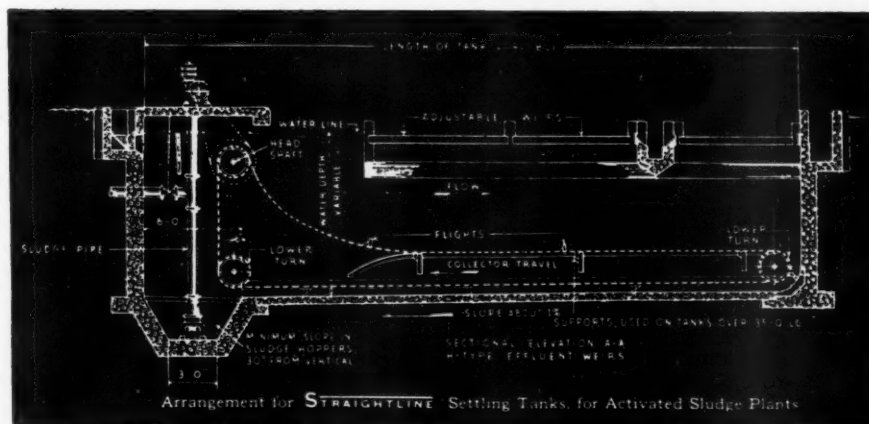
Details of "Straightline" settling tank for activated sludge plant installation.
